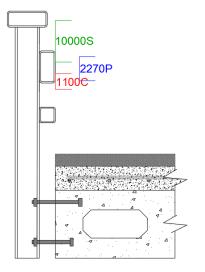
Structural Components of Front Bumper Adjacent to IL/OH MASH 2016 TL-4 Prototype Bridge Rail
